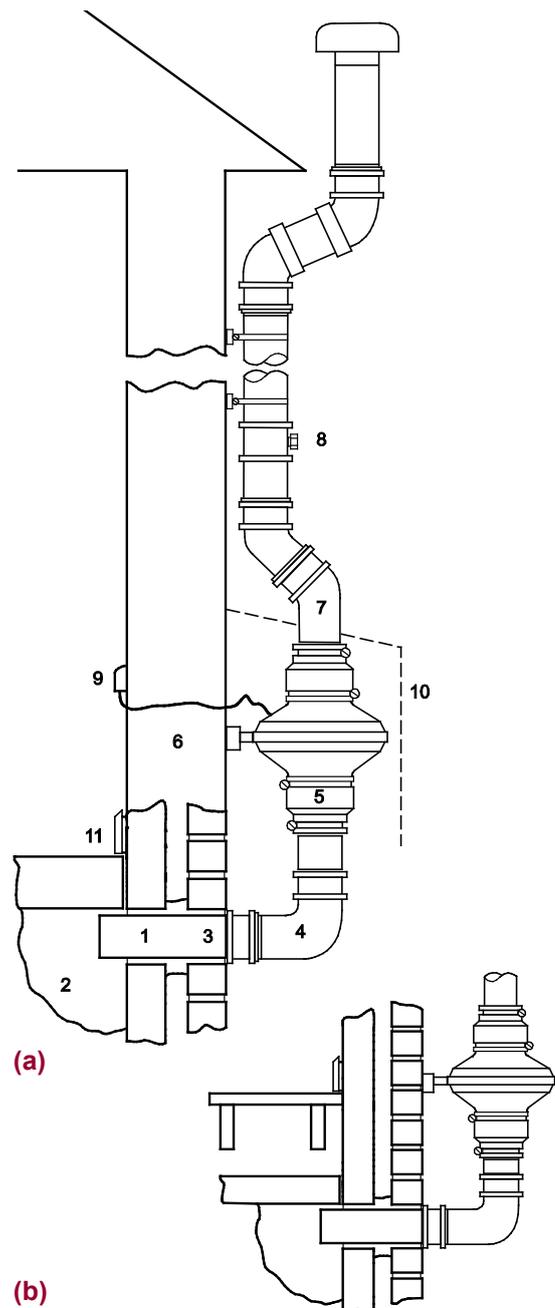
Mini sump system with high level exhaust: (a) under a solid floor and (b) under a suspended floor
